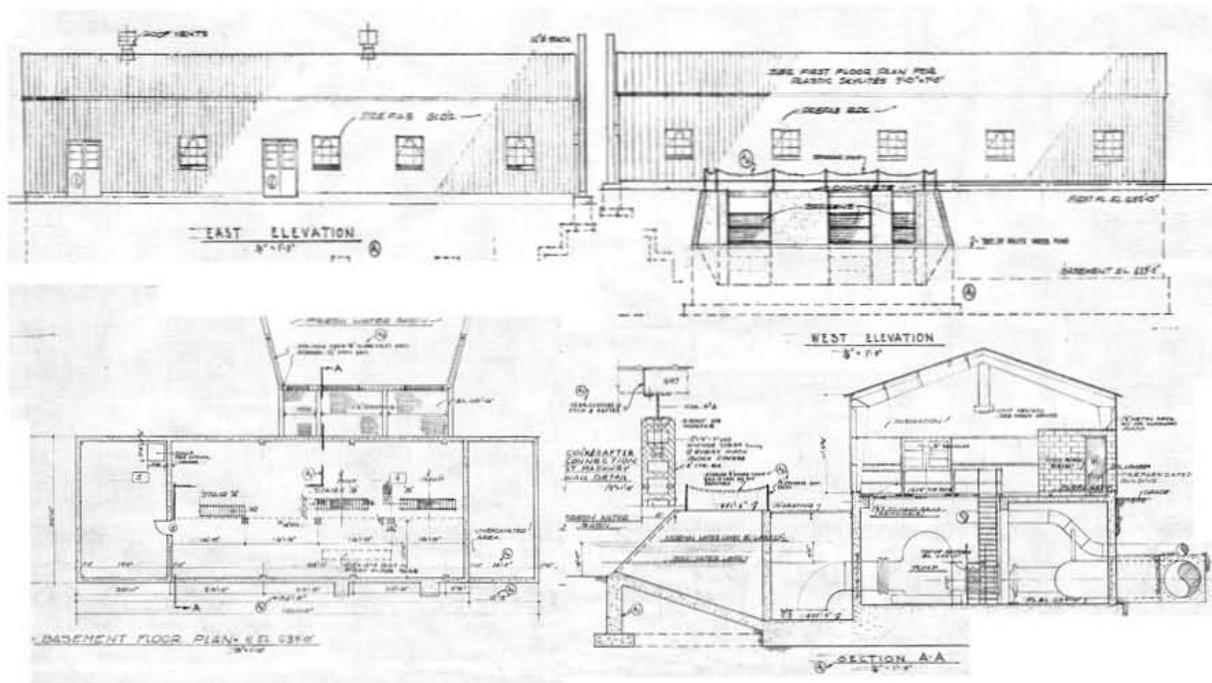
Pump and Shop Building elevations and floor plans, 1962 (PF-20468, NASA Glenn).
